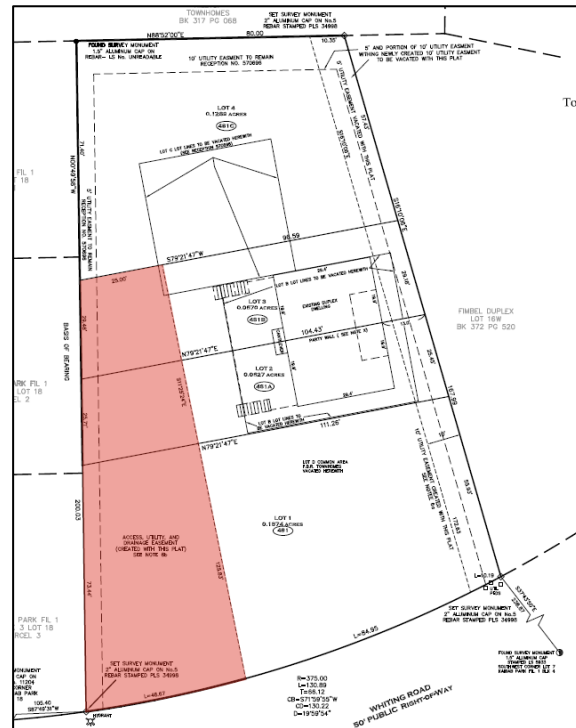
Except from Mullet Subdivision Final Plat highlighting the proposed Access, Utility, and Drainage easement.
